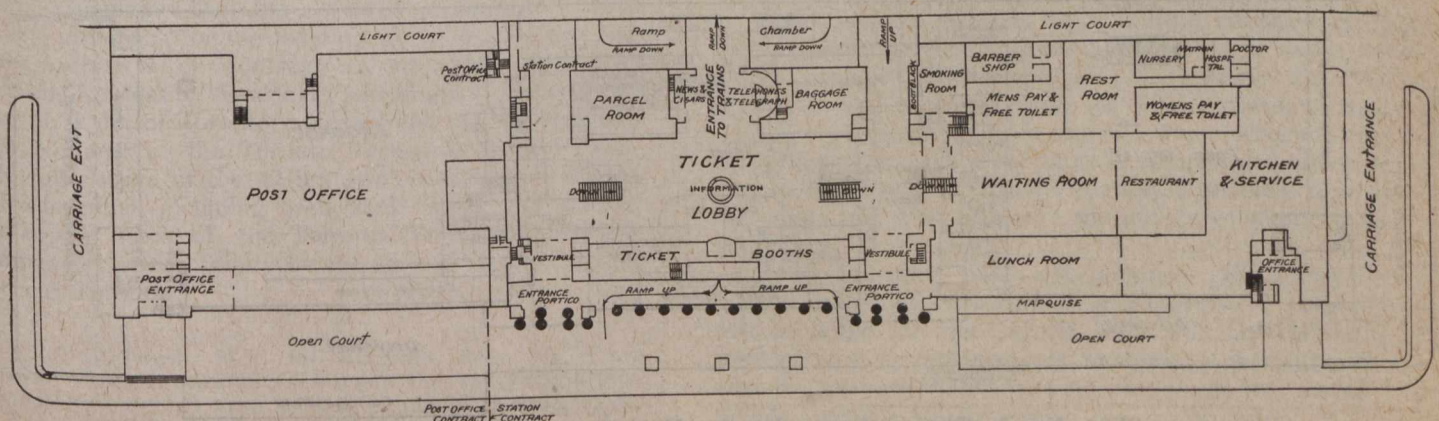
Plan of Main Level, New Union Station, Toronto
